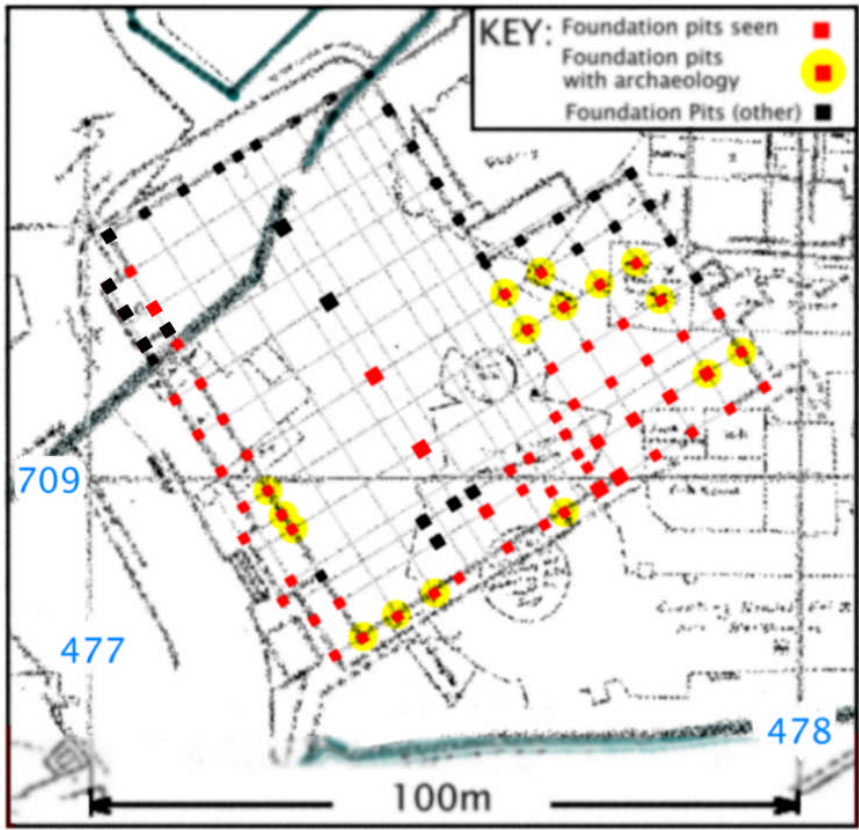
Superstore foundation pit plan superimposed on 1830s plan
